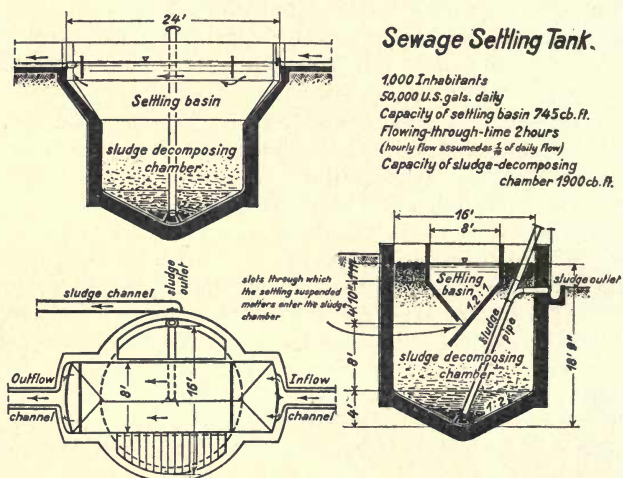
APPROVED PLAN FOR IMHOFF TANK.
